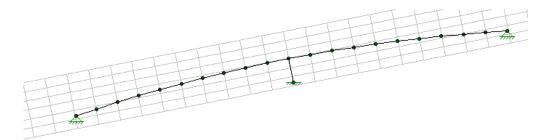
Typical Spine Beam Model of a Curved Concrete Box Girder Bridge
